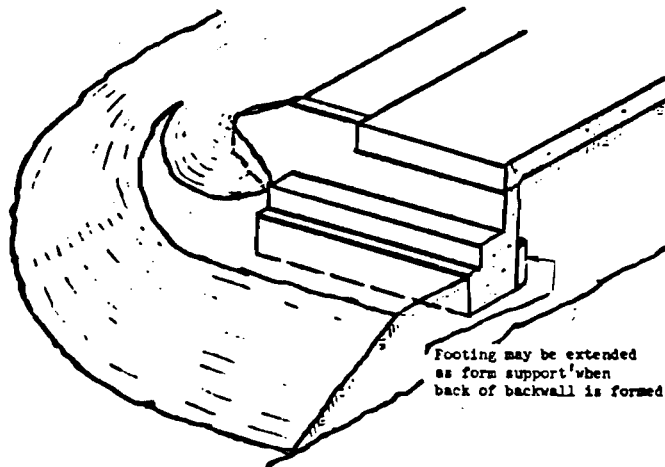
Typical stub or shelf abutment (from Ref 2).
